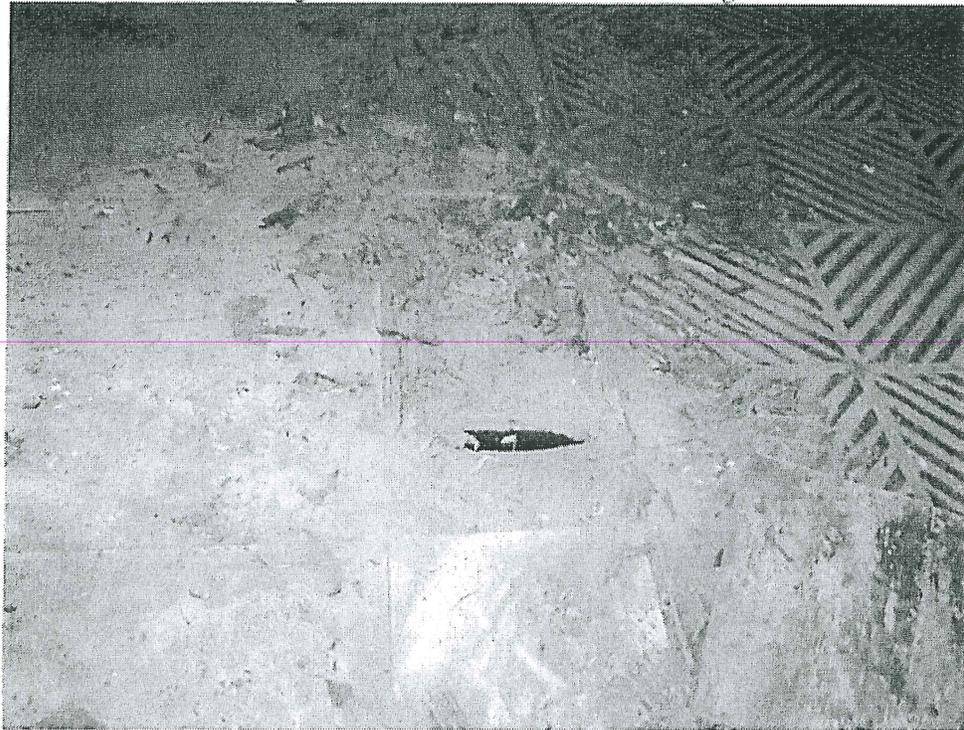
Water damage to the first floor deck near the entry
